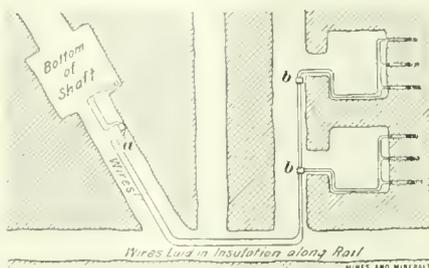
WIRING FOR ELECTRIC SHOT FIRING
